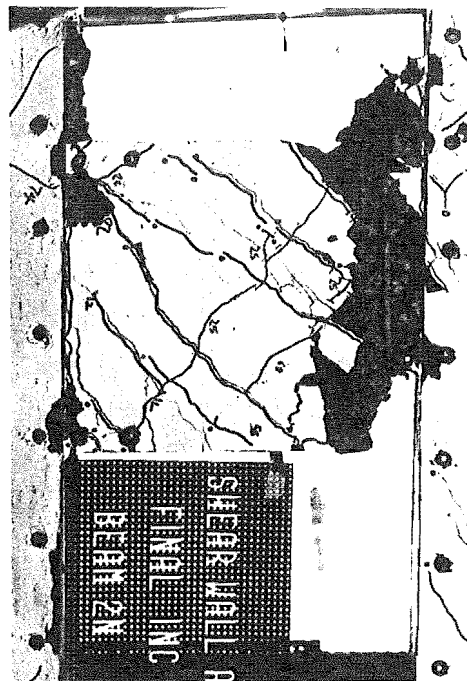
SLIDING SHEAR FAILURE OF LEVEL 6 BEAM IN COUPLED SHEAR WALL TESTED BY SANTHAKUMAR (30)
